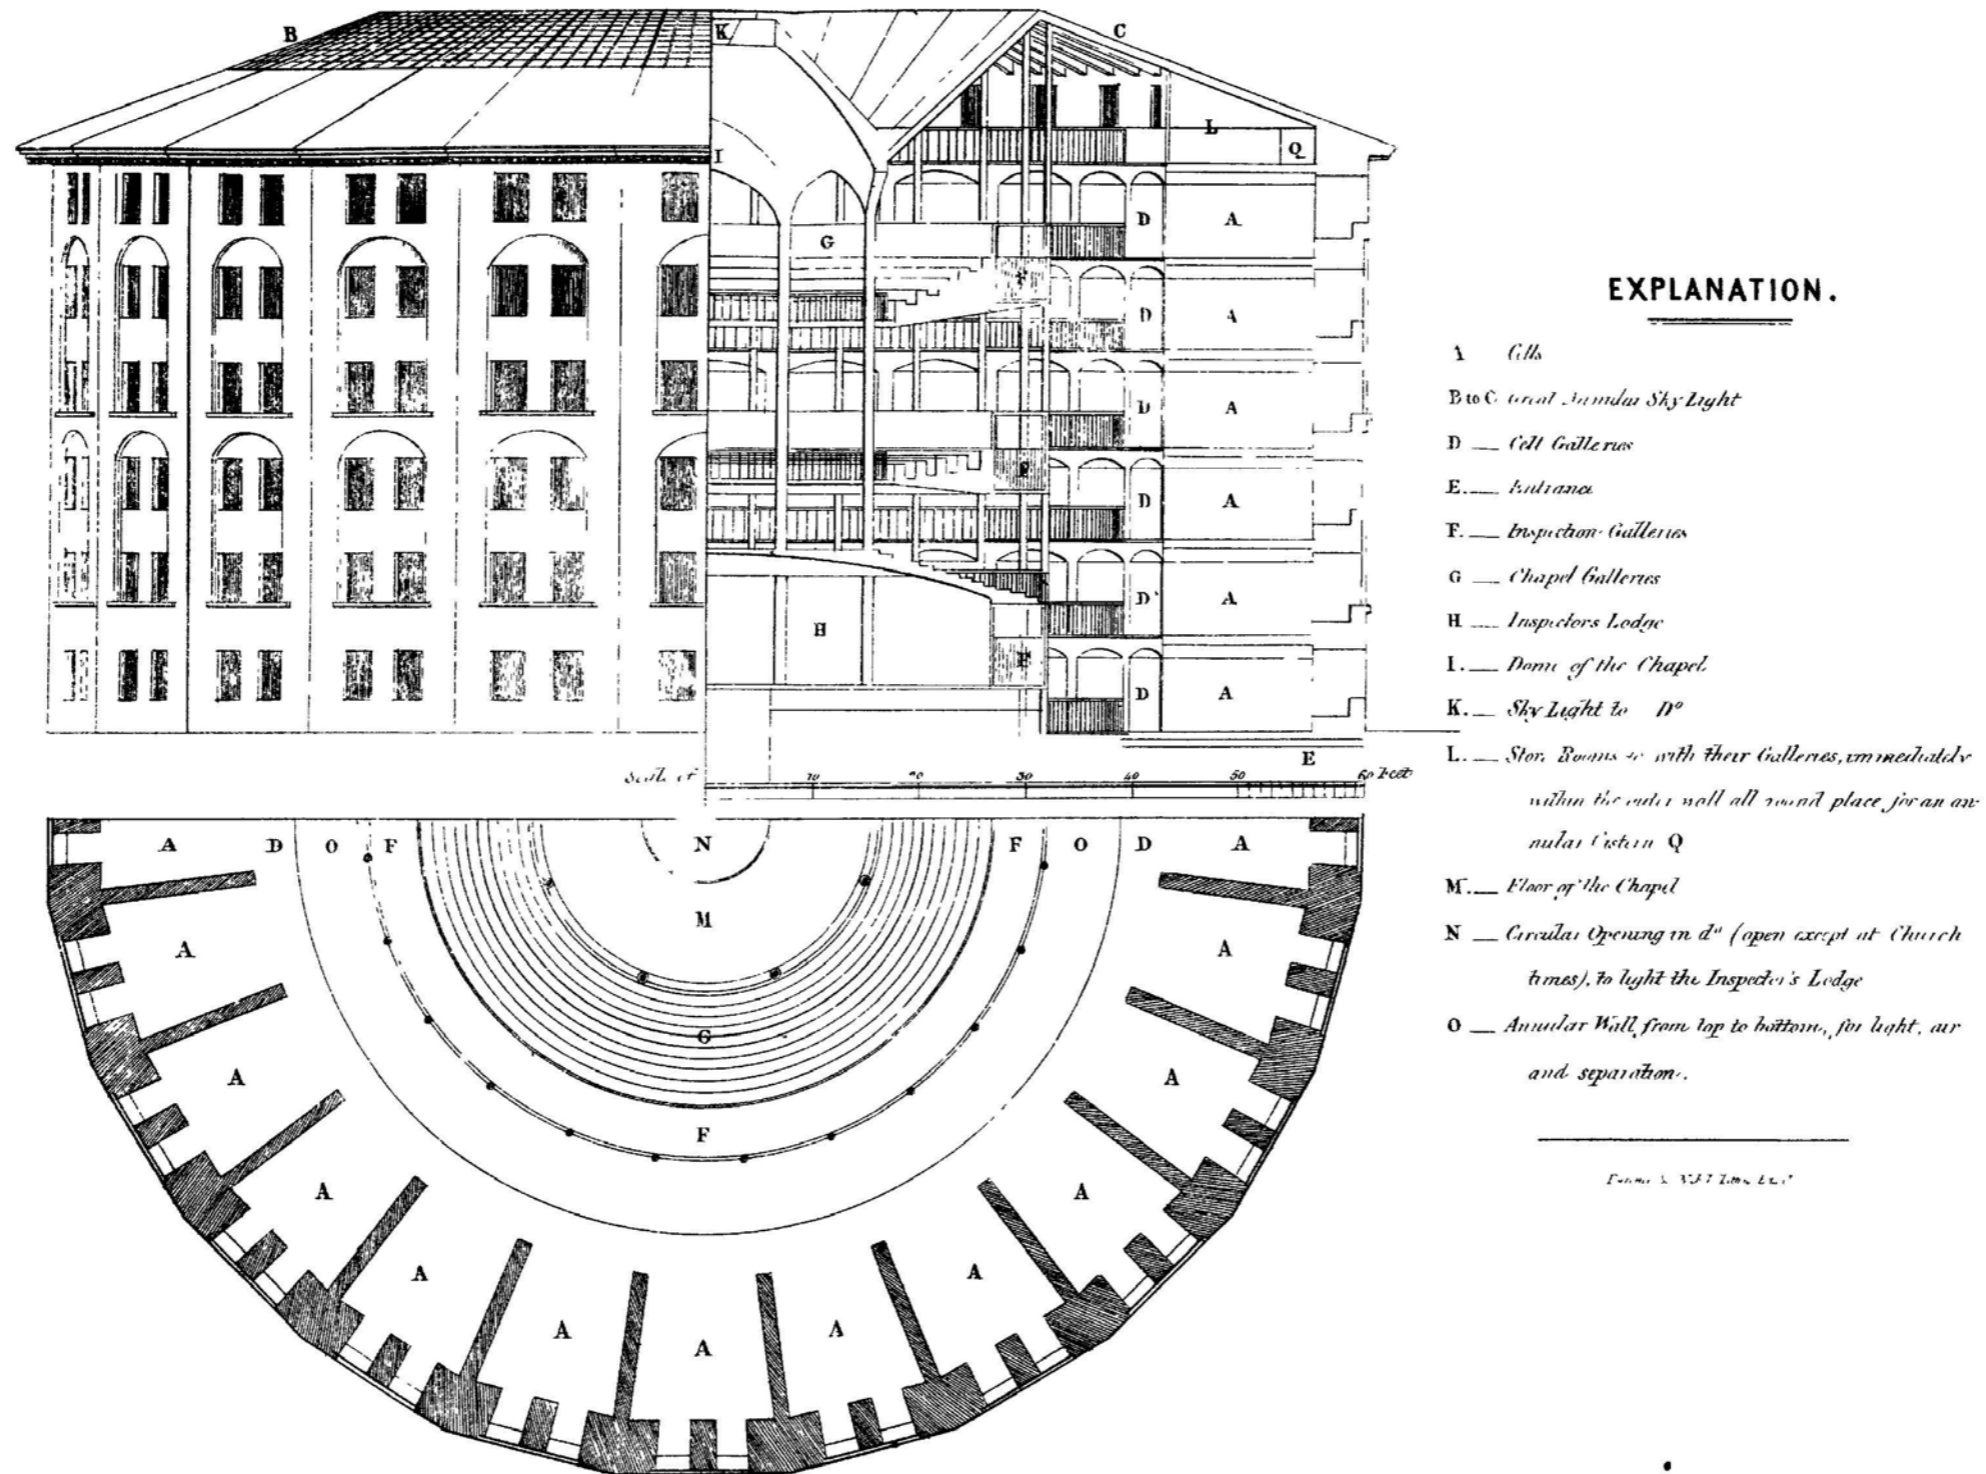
Plan and section of Bentham's Panopticon (source: Bentham, 1843: 172-73).
